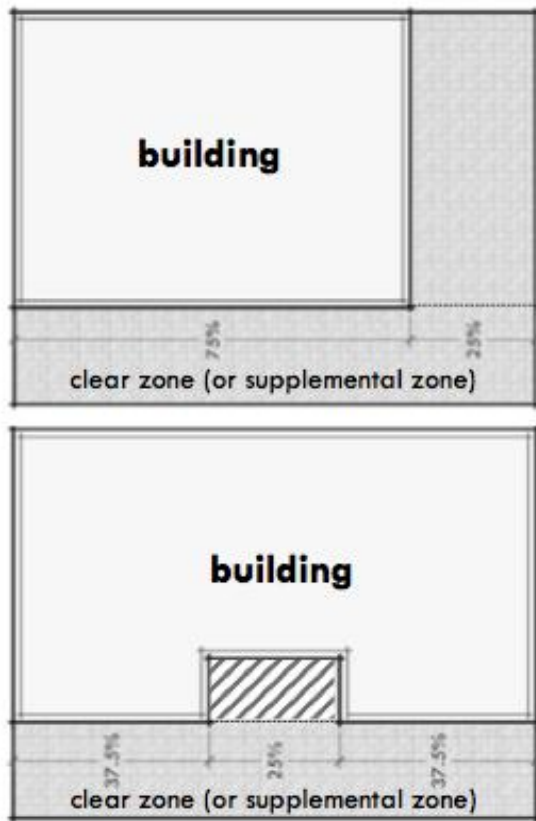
Examples of permitted building placement along core transit corridors. Parking is not permitted in the hatched area between the street-facing facade and the sidewalk.
